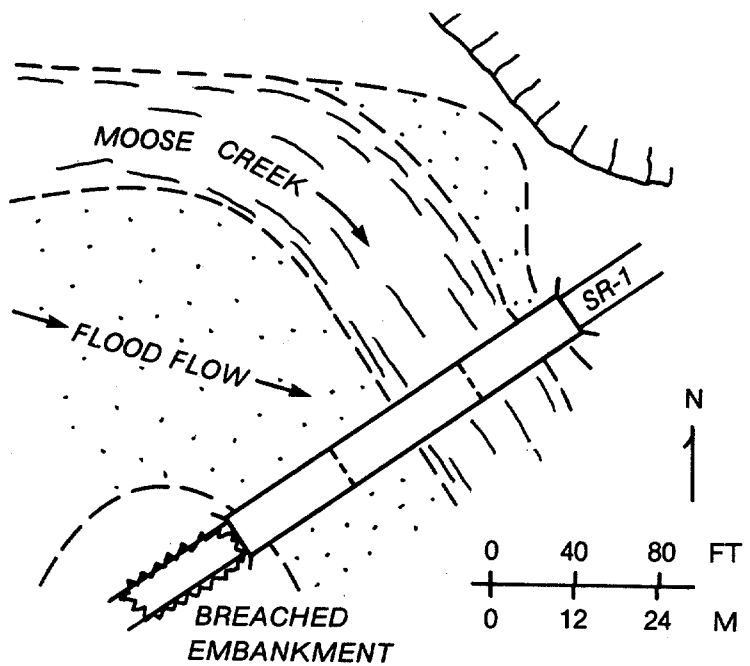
Plan sketch of SR-1 crossing (After Norman, 1975).
